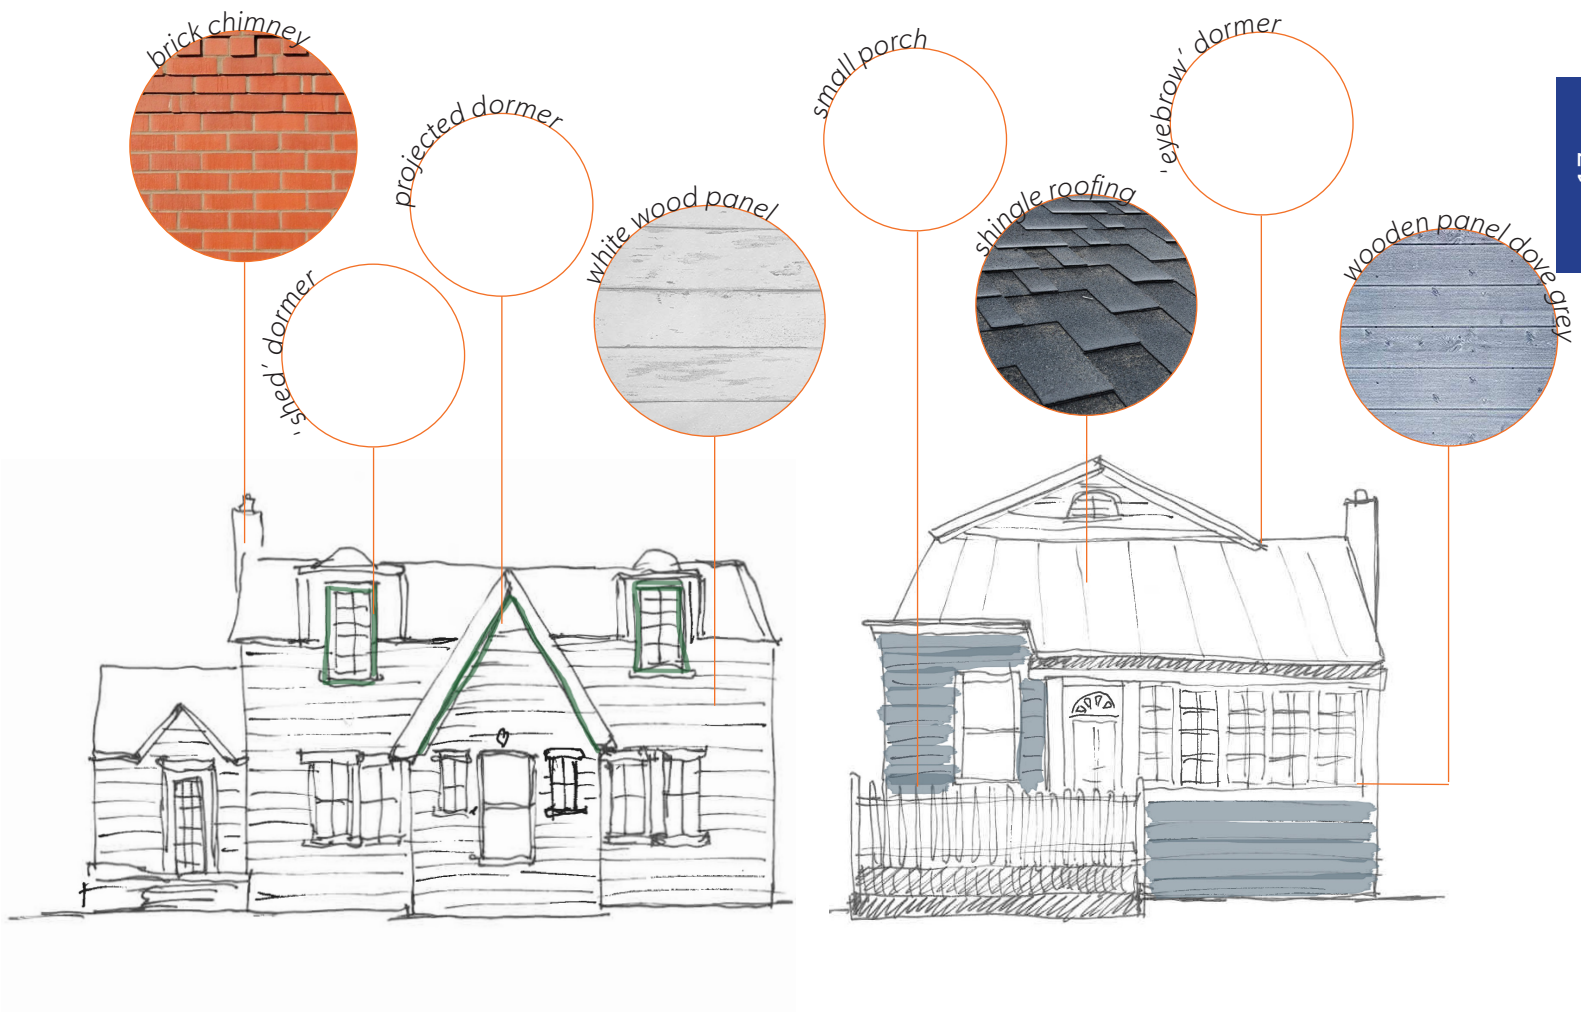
Sketch of Typical Residential Buildings along Walker Road.
